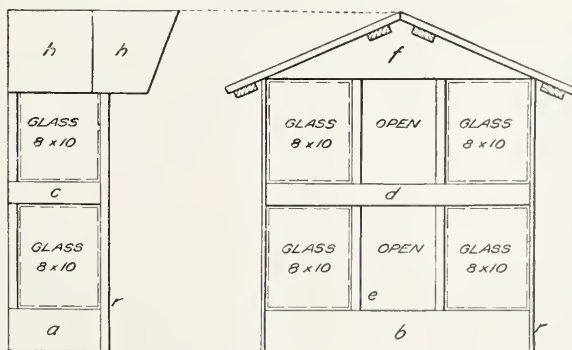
FRONT AND SIDE ELEVATIONS OF SHELTER SHOWN IN FIGURE 1.
